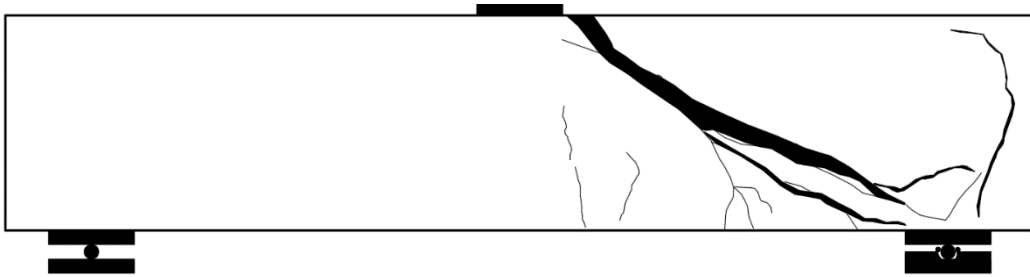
Crack pattern at failure for SNFRC 0.75% beam #7
